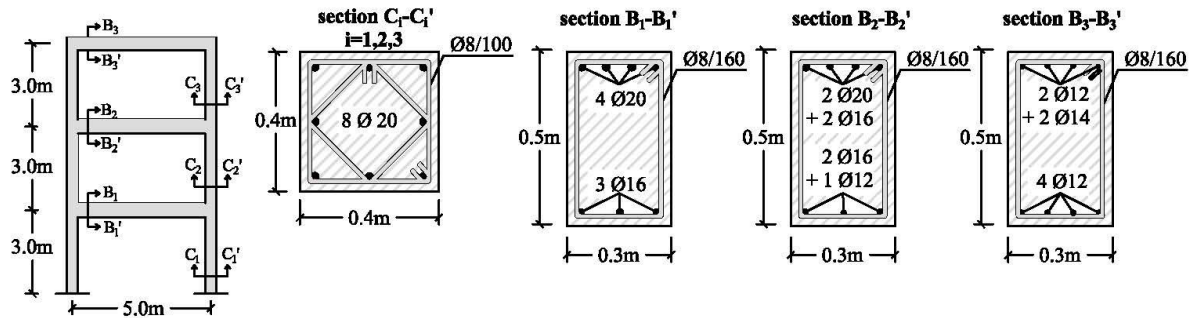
Configuration details of the adopted reinforced concrete frame
